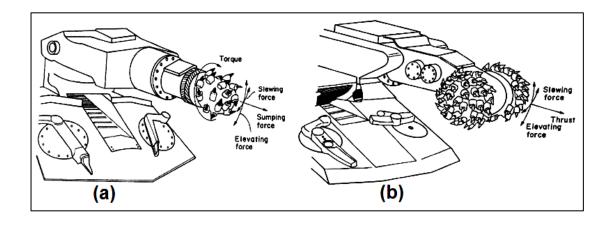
Road Headers Types: a) Milling b) Ripping (Fowell, 1993)
